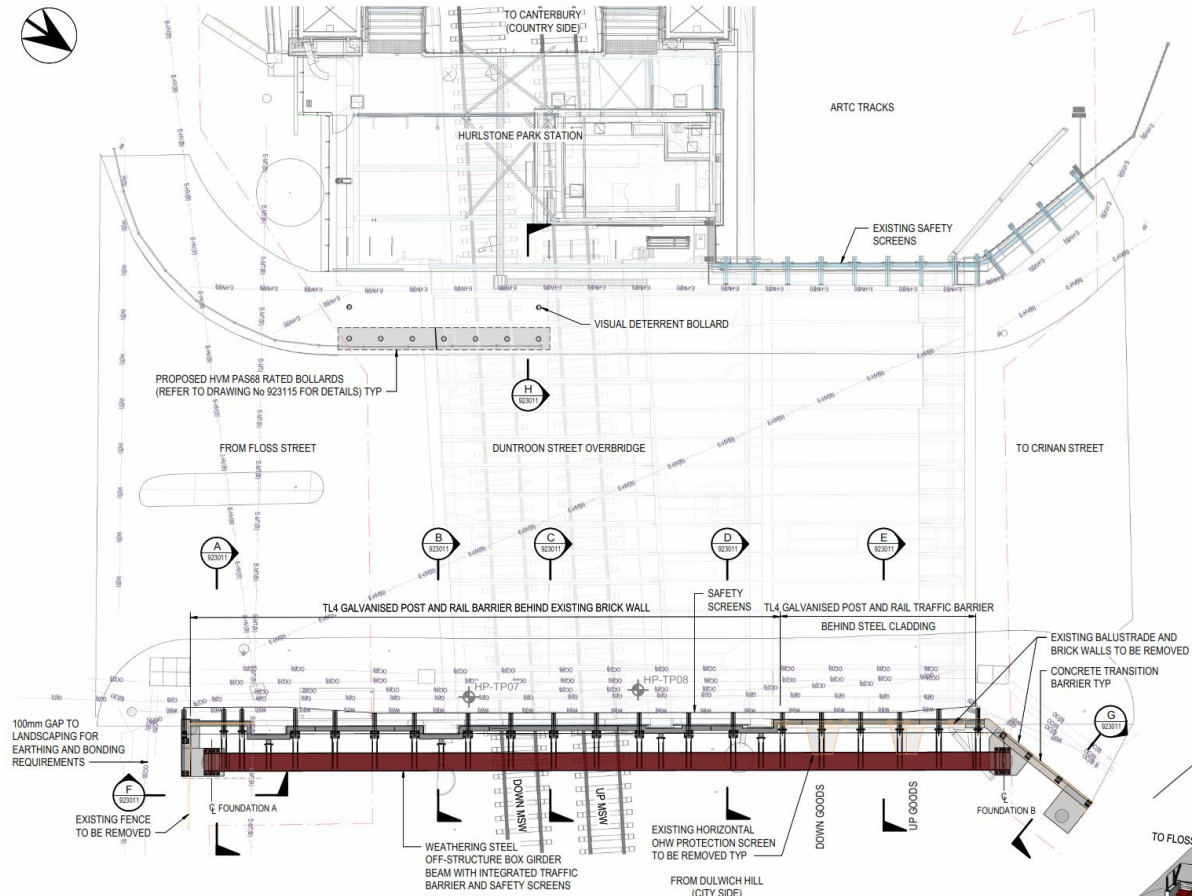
Plan of treatment works for Duntroon Street Bridge (Source: Metron T2M 2022/Aurecon 2024, provided by ARCH Artifex)
